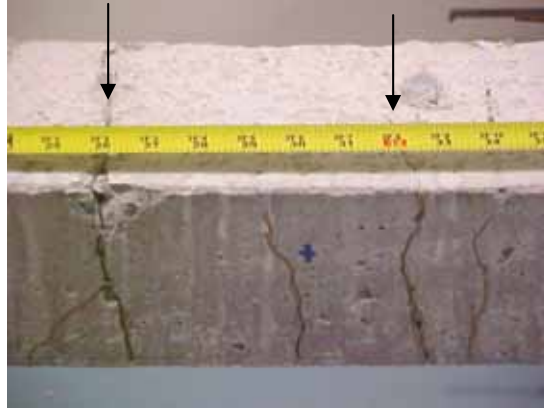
The over-reinforced concrete beam has localized tensile cracks and concrete crushing in the impactor regime (test 15 conducted at 5 m/sec (16.4 ft/sec)).
